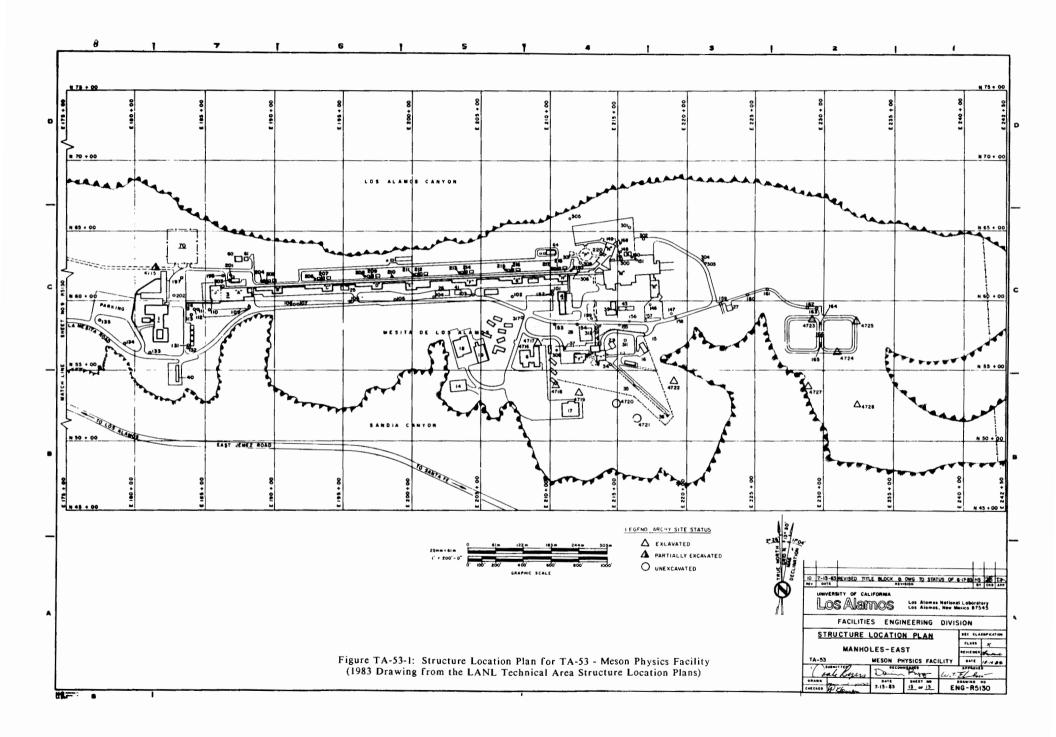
Structure Location Plan for TA-53 - Meson Physics Facility (1983 Drawing from the LANL Technical Area Structure Location Plans)
